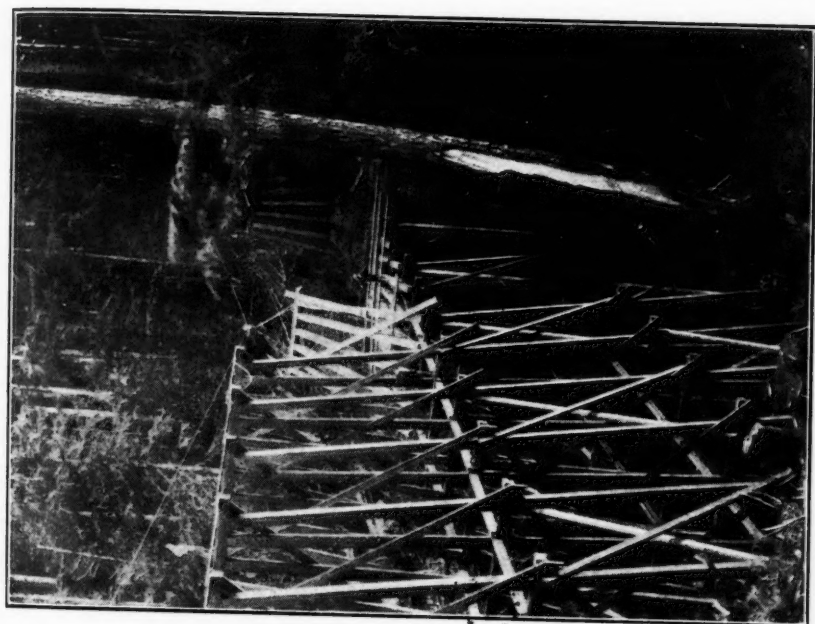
FRAME TRESTLE OF LOGGING RAILROAD
